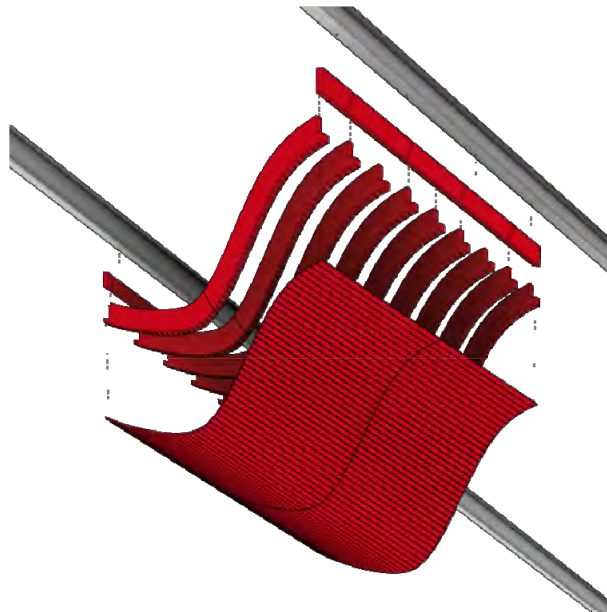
Explosion drawing of a façade element (*designtoproduction*)
